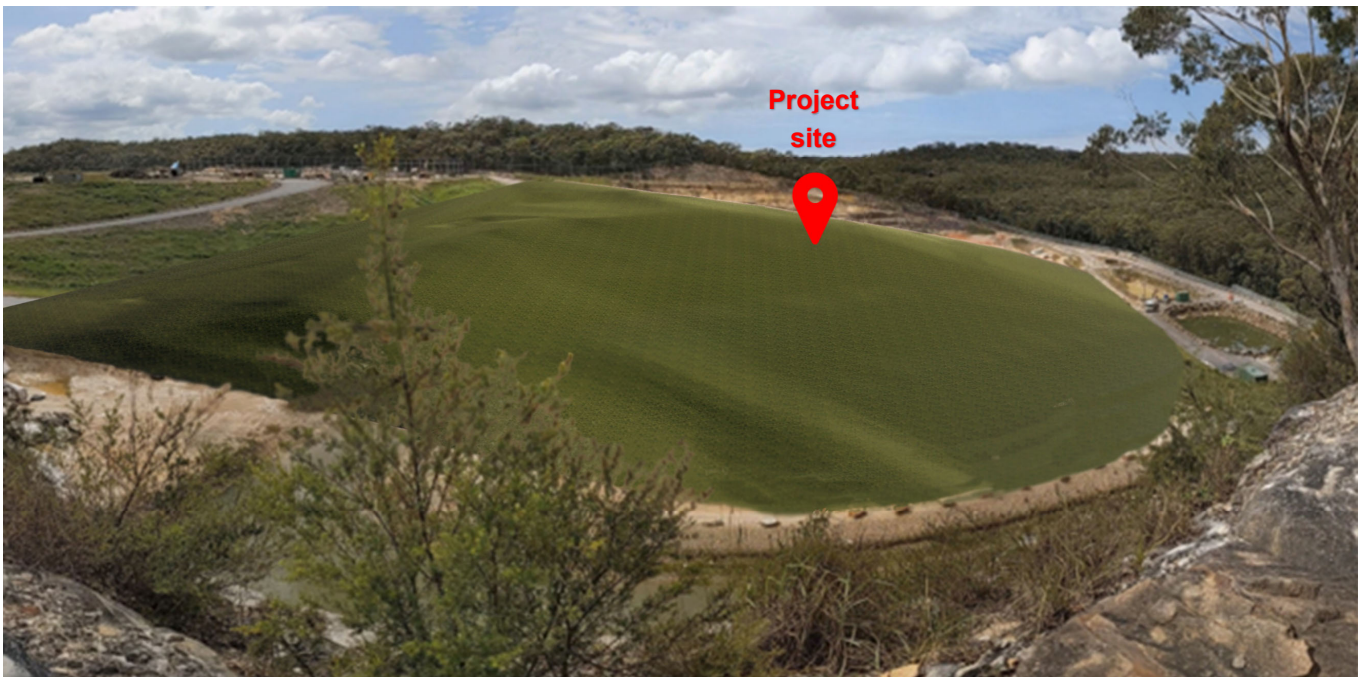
Viewpoint 4 – Great North Walk – Post Development Final Landform
